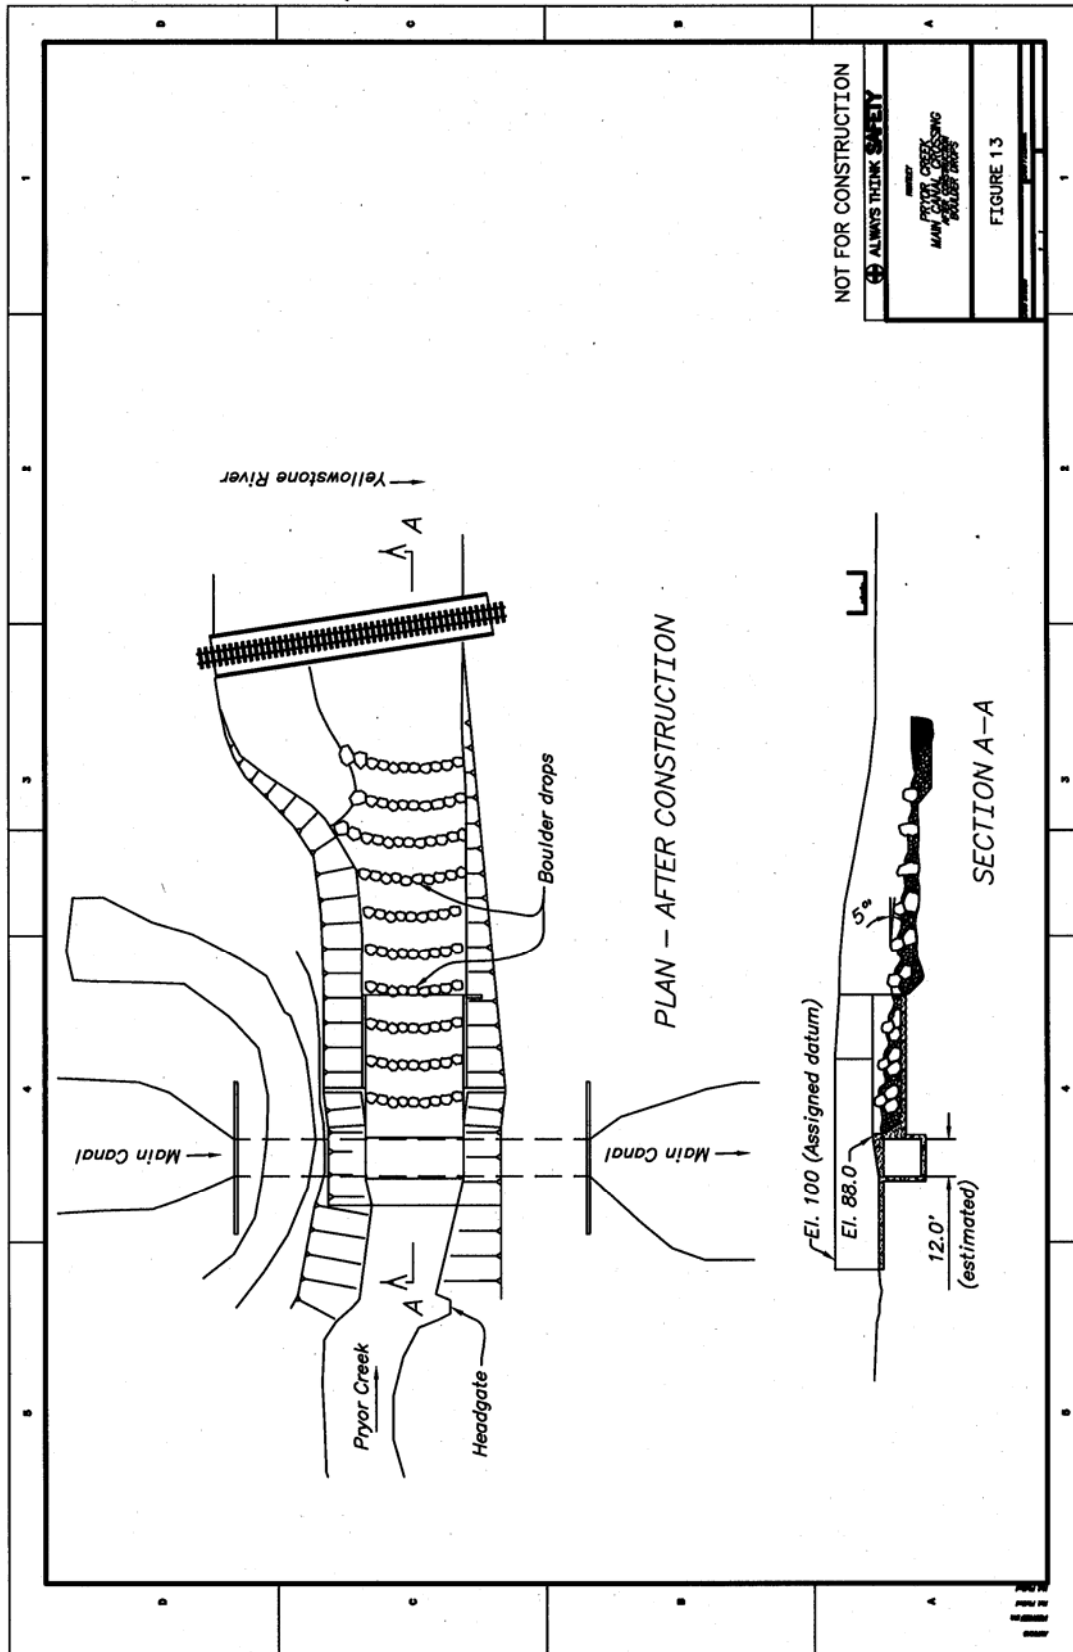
Plan and sections of a rock ramp with boulder drops fishway option, Huntley Canal crossing on Pryor Creek
